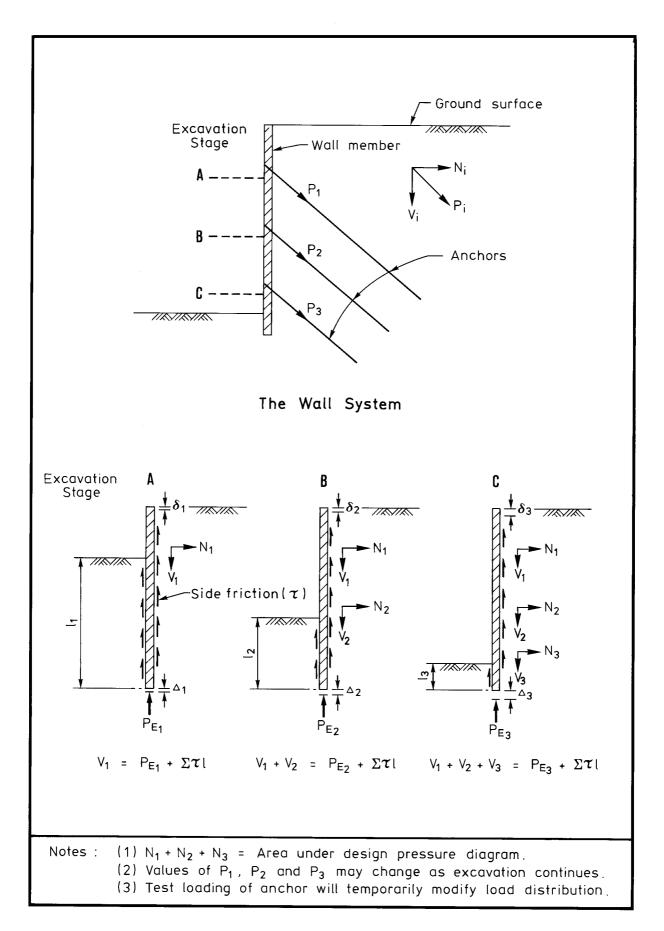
Idealised Force System on an Anchored Wall (Hanna, 1968)
